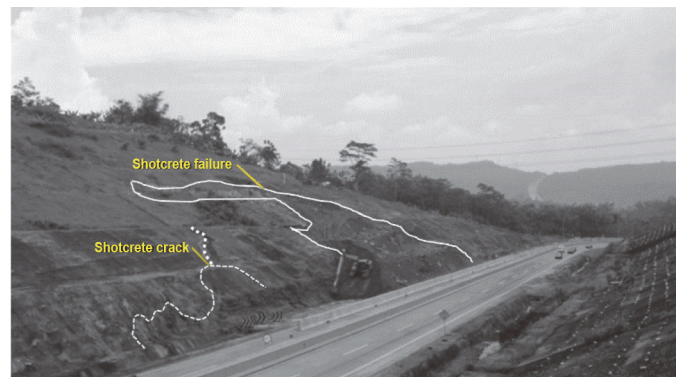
Shotcrete cracks and failure at Bawen toll road
